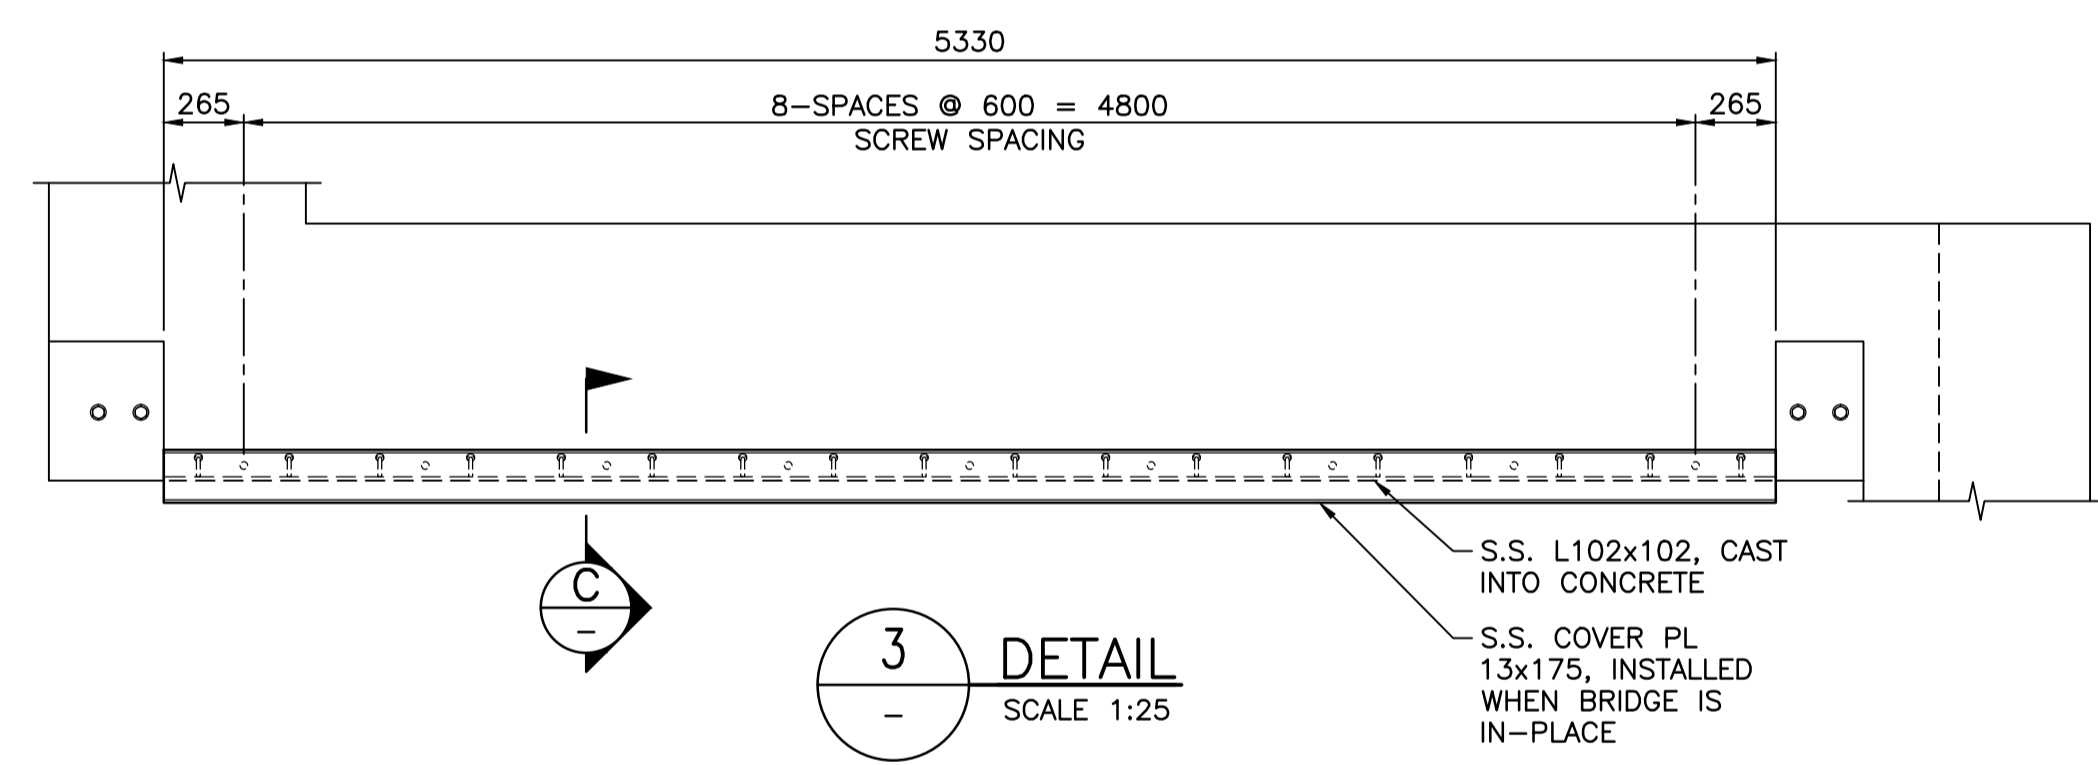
DETAIL - TYPICAL CONSTRUCTION JOINT (CJ)
